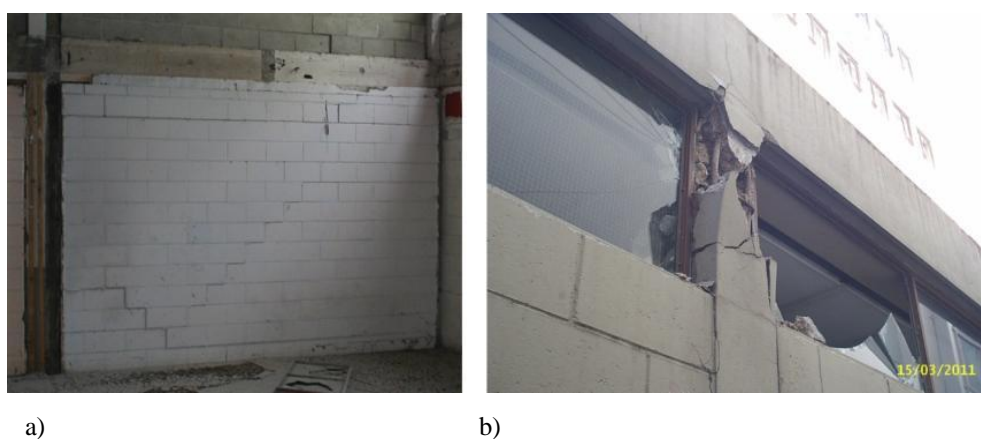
Observed damage on masonry infills after the 22nd February 2011 Christchurch earthquake: a) Sliding shear and column damage, b) Sliding shear and diagonal crack
